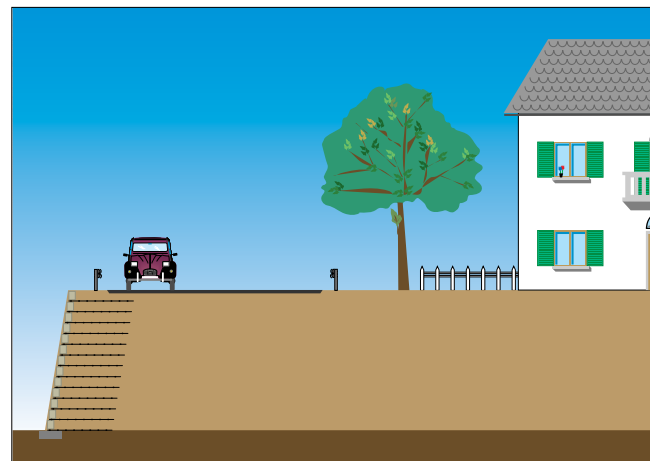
A counterscarp wall supporting a mid-slope road, with the face made up of thin concrete panels.
